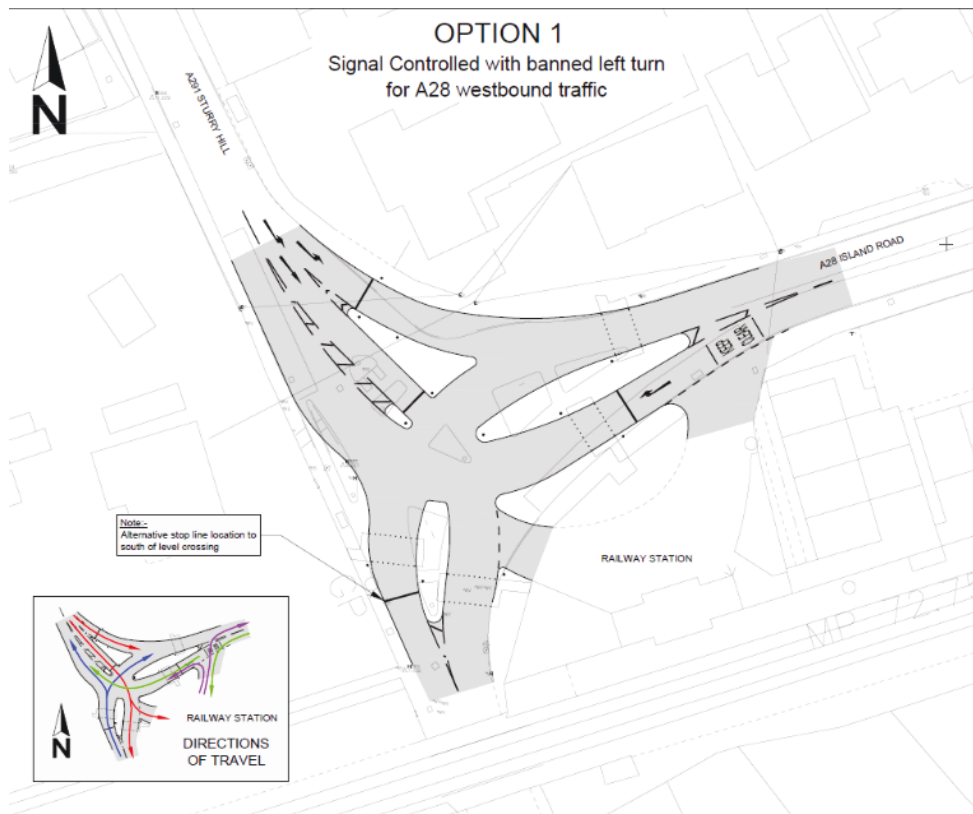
Option 1 for the Proposed Road Layout North of Sturry Level Crossing
